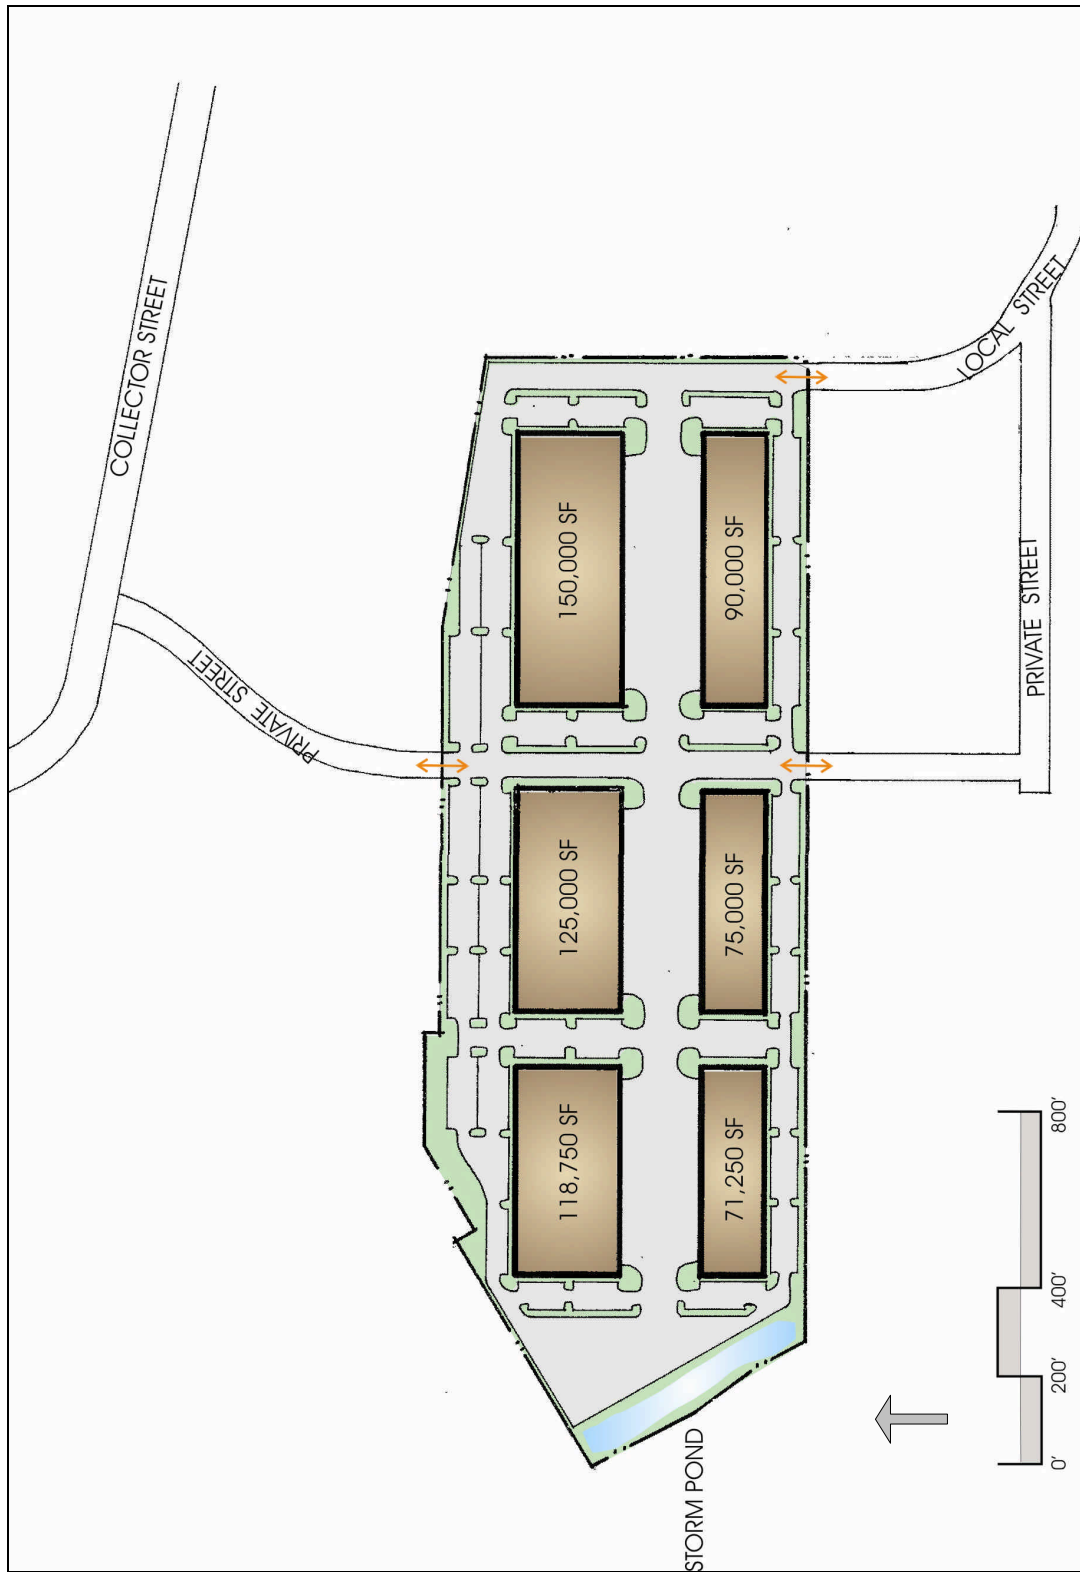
Industrial Park Brownfield Conceptual Site Plan
